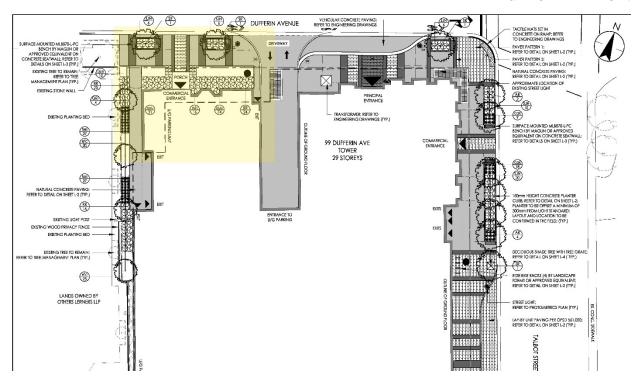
Landscape plan with 93-95 Dufferin Avenue interface with new development highlighted (SPA17-035 submission, April 28, 2020)
